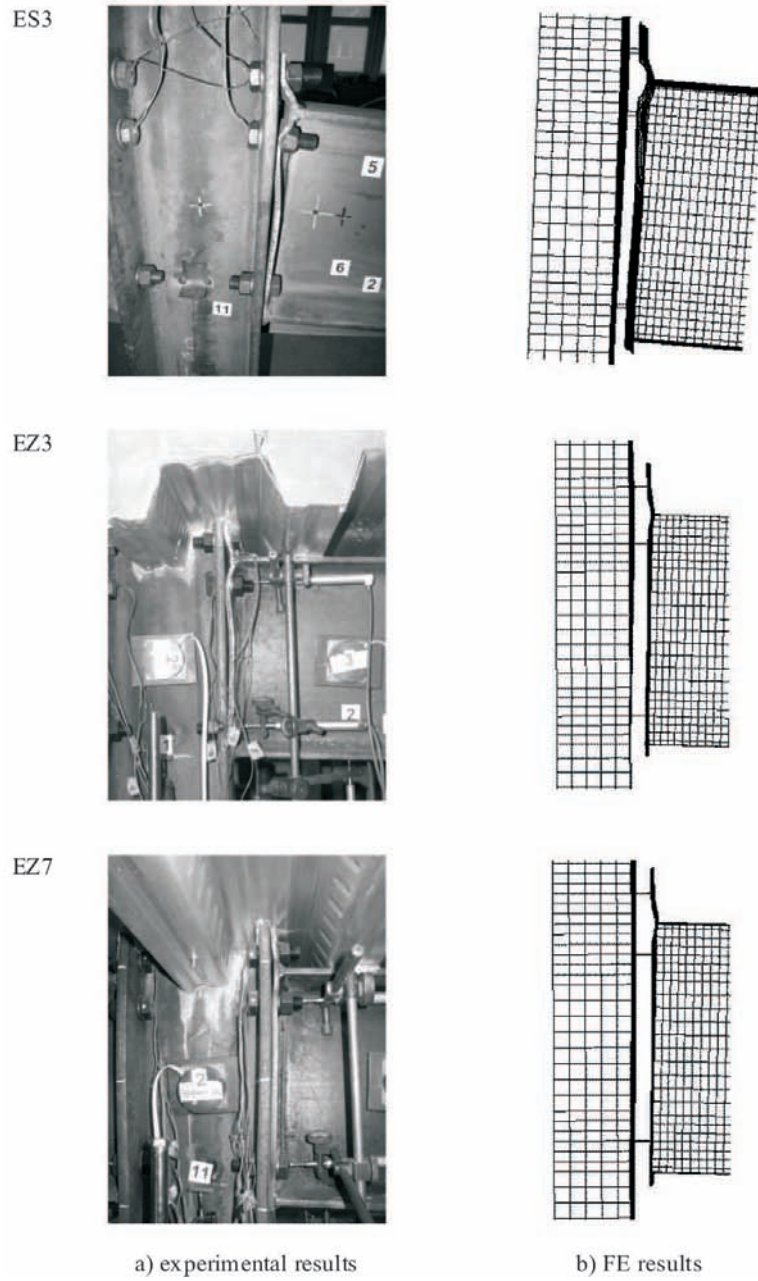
Deformed shape of joints with 8 mm extended end-plates.
